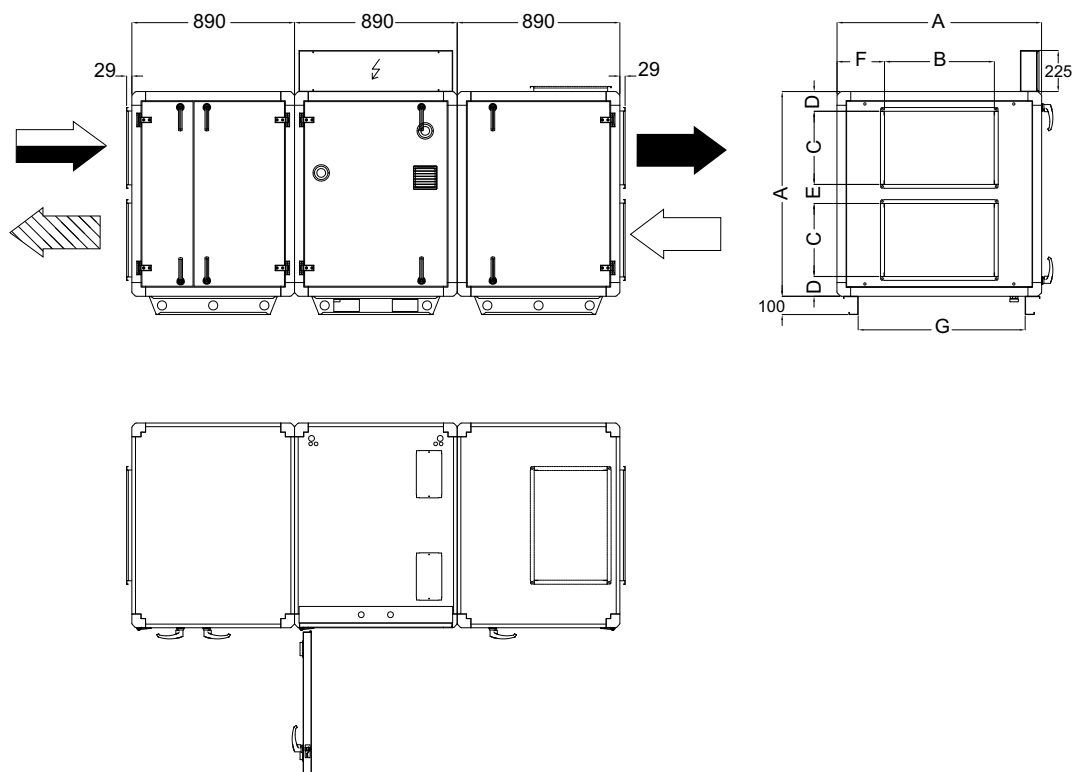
Dimensions (mm) SR09, SR11 (Drawn as left hand unit)
